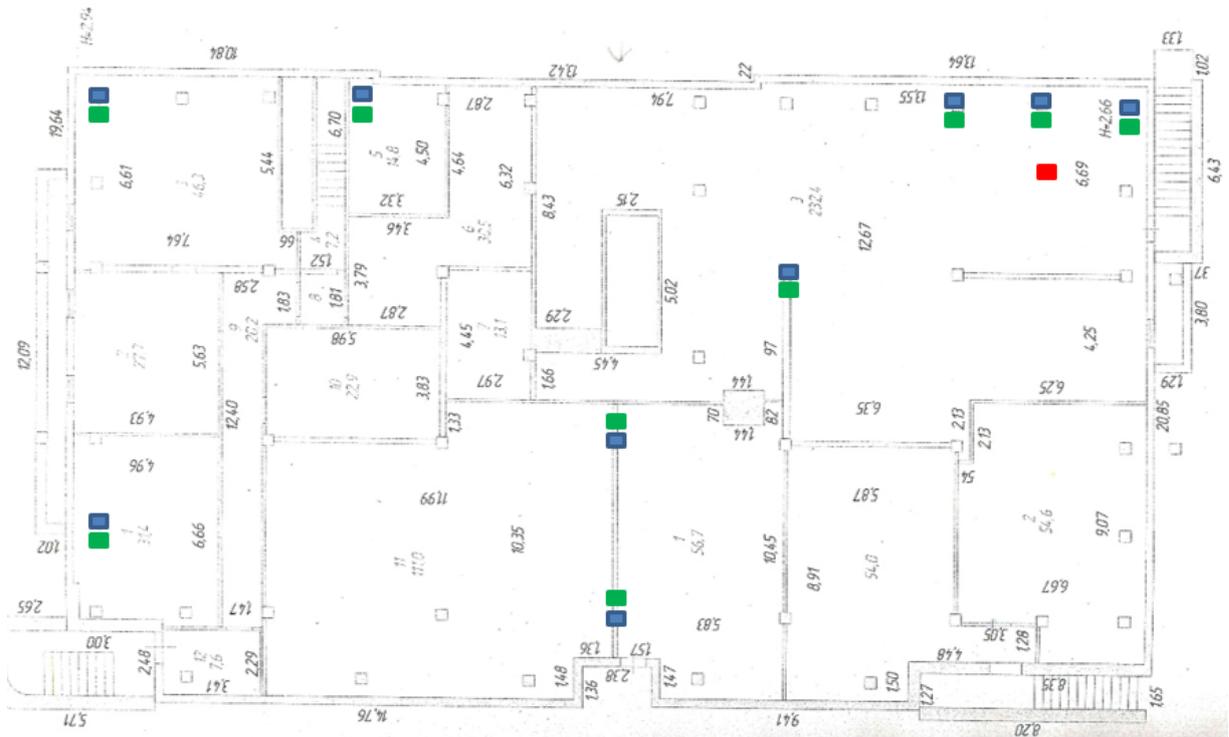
The scheme of ultrasound examinations of the basement of the building (blue-reinforced concrete columns; green-reinforced concrete grilling's; red-reinforced concrete slabs)
